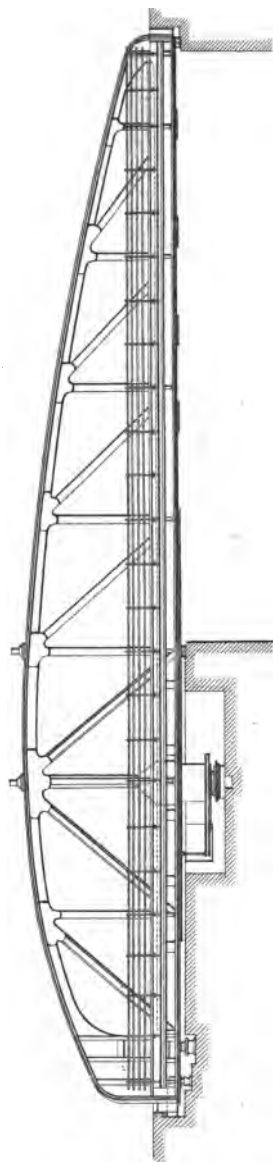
shows a "Hydraulic Swing Bridge" constructed by Sir William Armstrong, Mitchell & Co. This bridge crosses a clear opening of 100 feet, and is adapted for both road and roadway traffic. The clear width of roadway between the kerbs is 23 feet. The footways are on the outside of the main girders, and have each a clear width of 4 feet 10 inches. The bridge is designed for a rolling load of $1\frac{1}{4}$ tons per foot run on each line of railway, and for a concentrated load of 60 tons on
